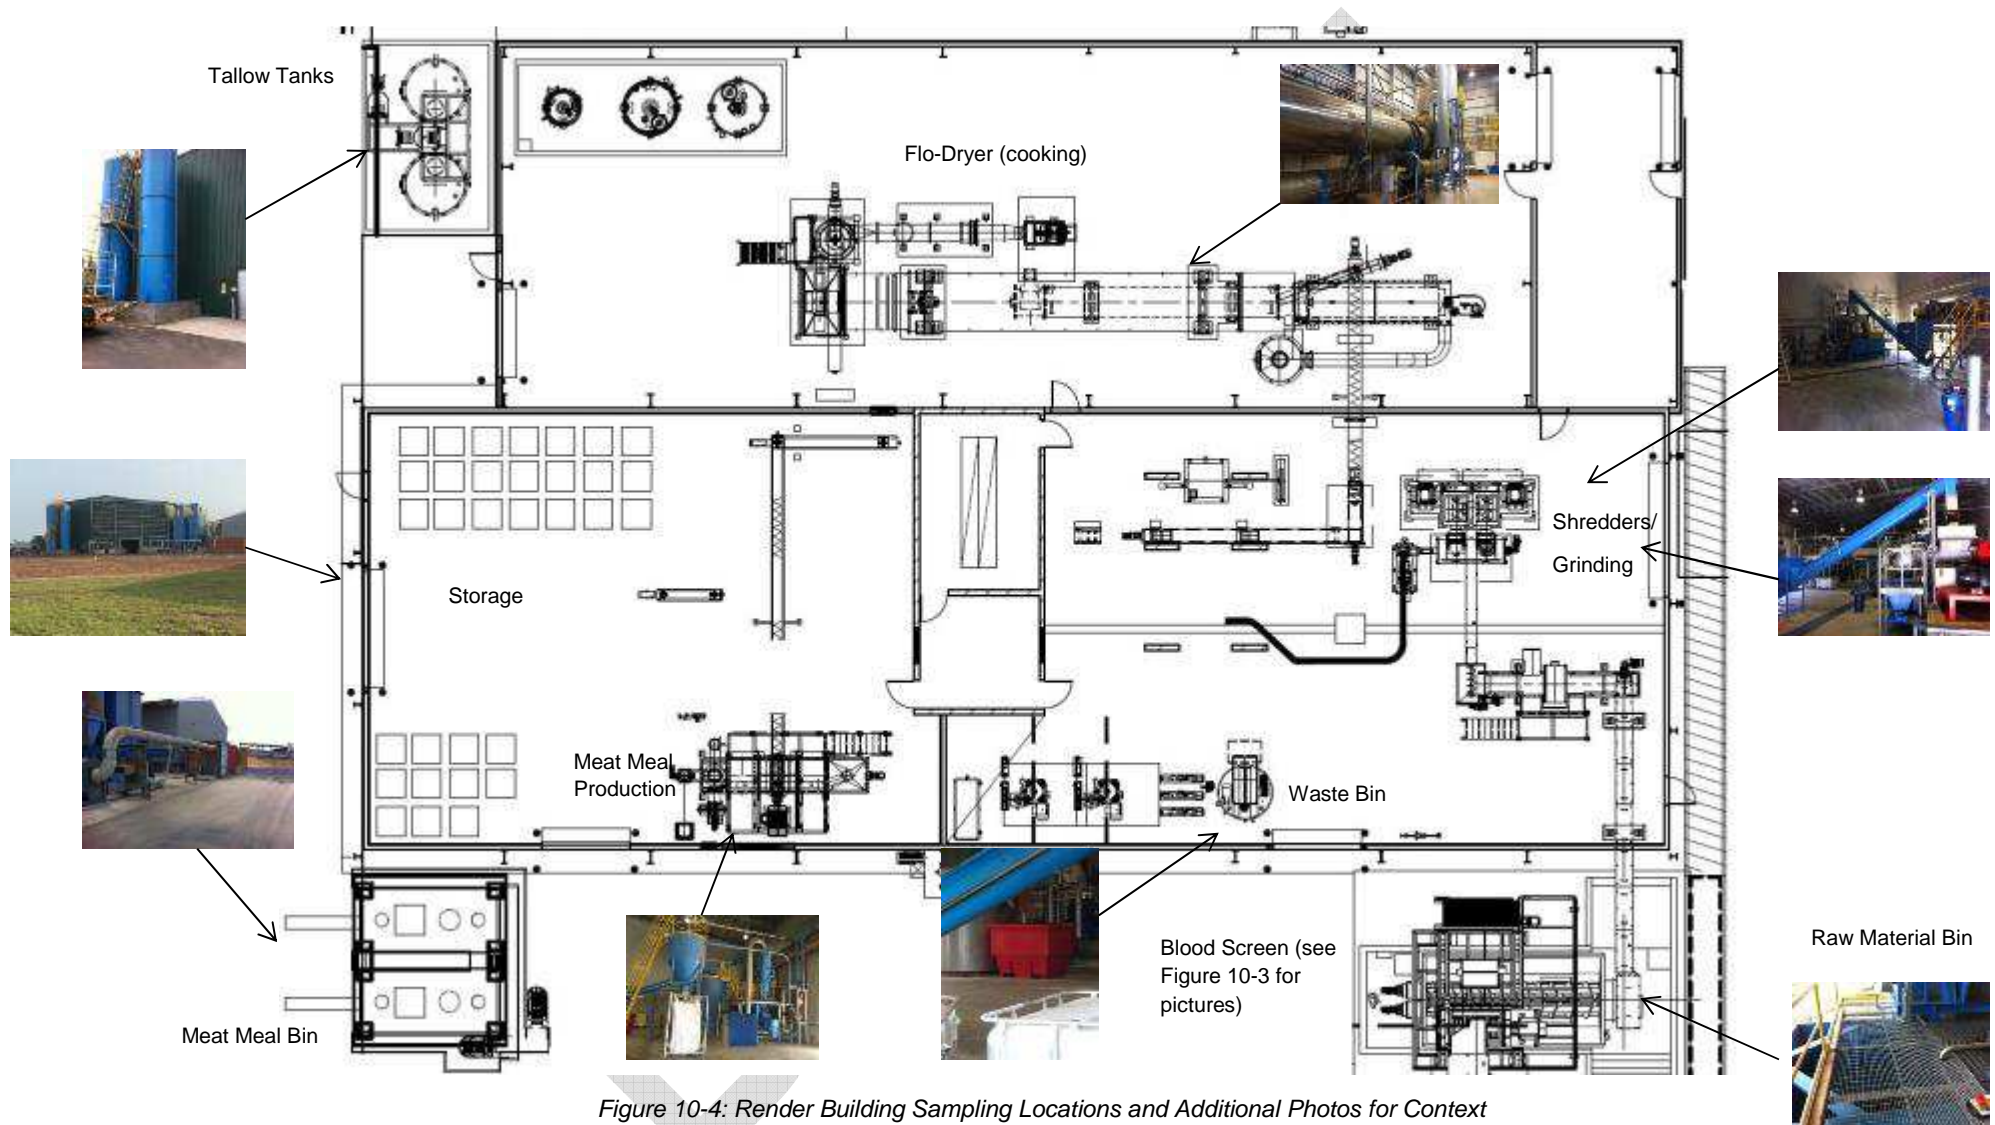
Render Building Sampling Locations and Additional Photos for Context
